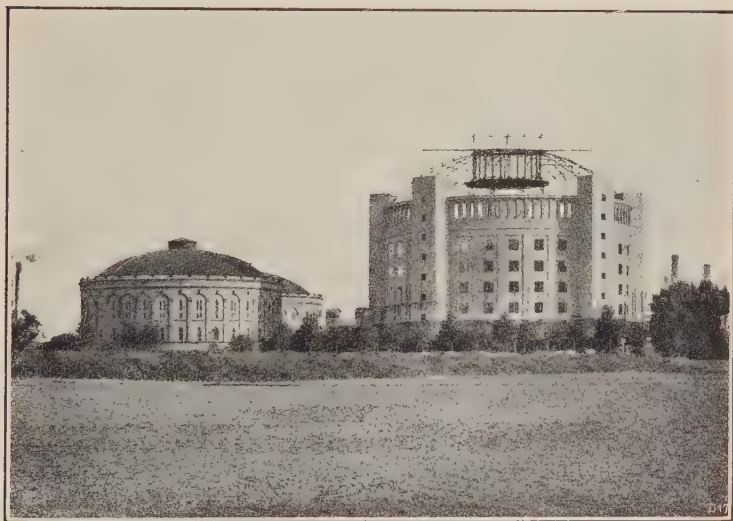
REINFORCED CONCRETE WALLS FOR GAS HOLDER, DRESDEN, GERMANY.
